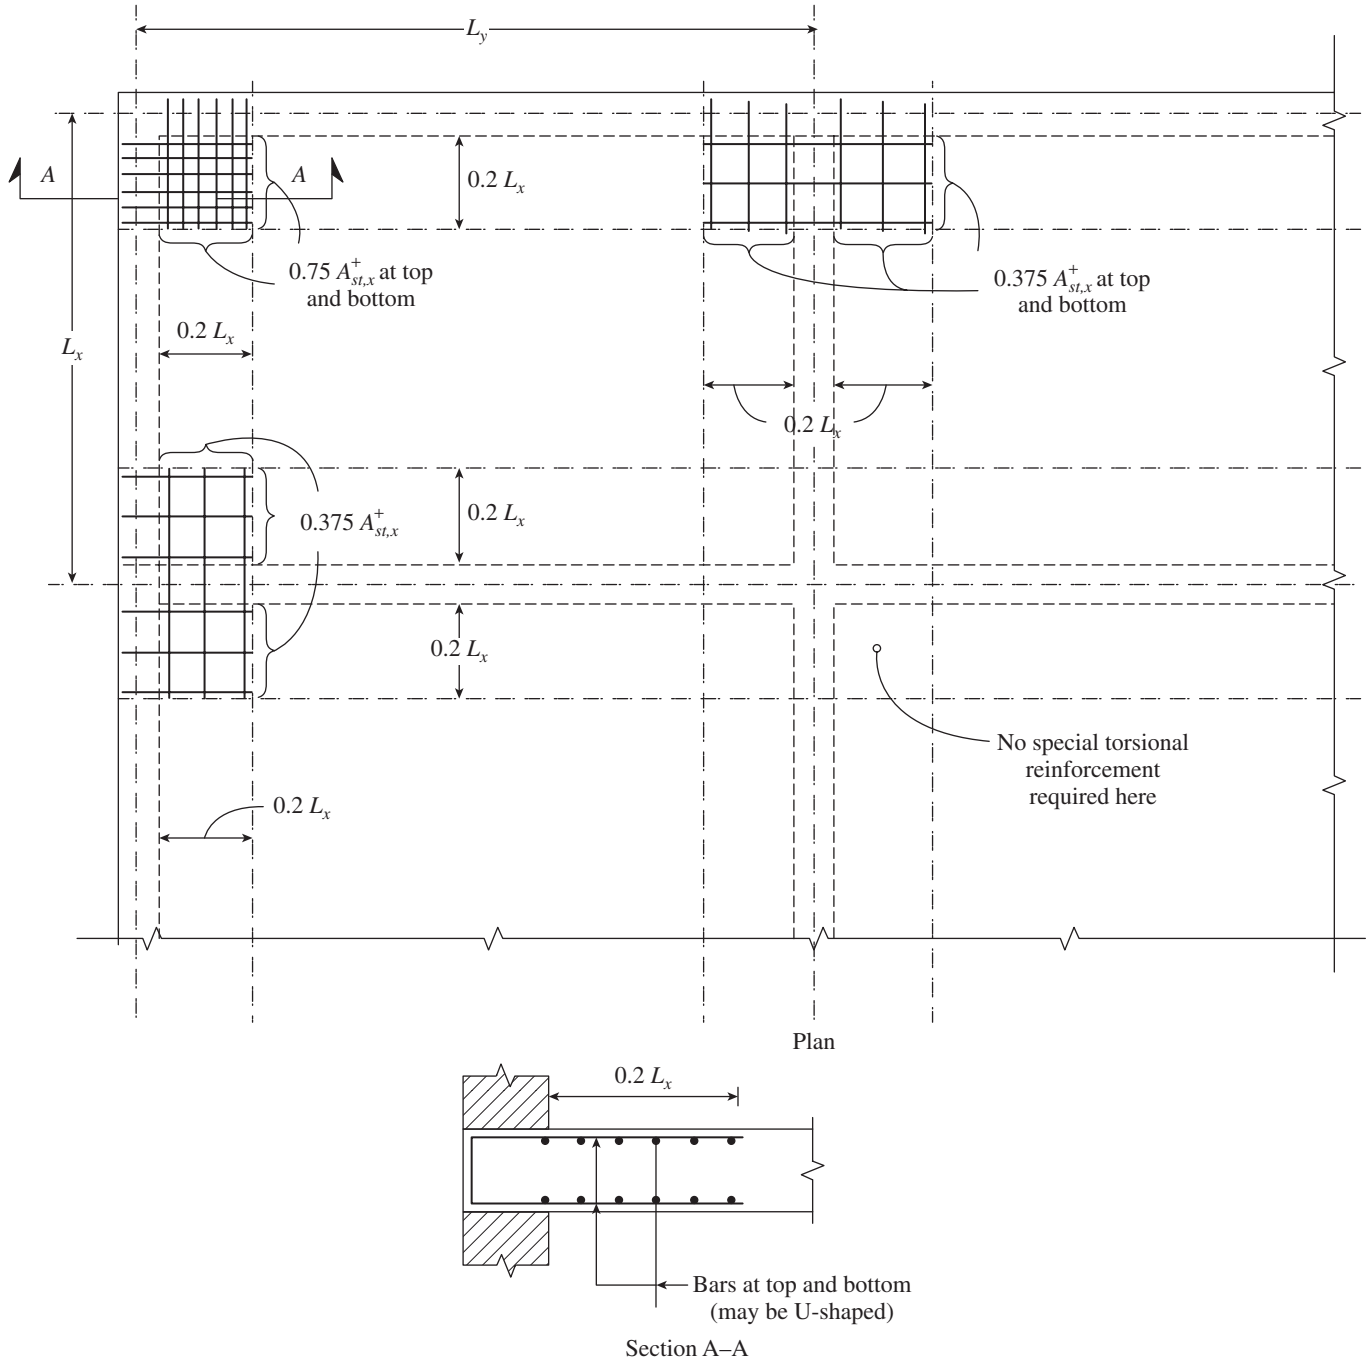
Detailing of torsional reinforcement in restrained slabs
